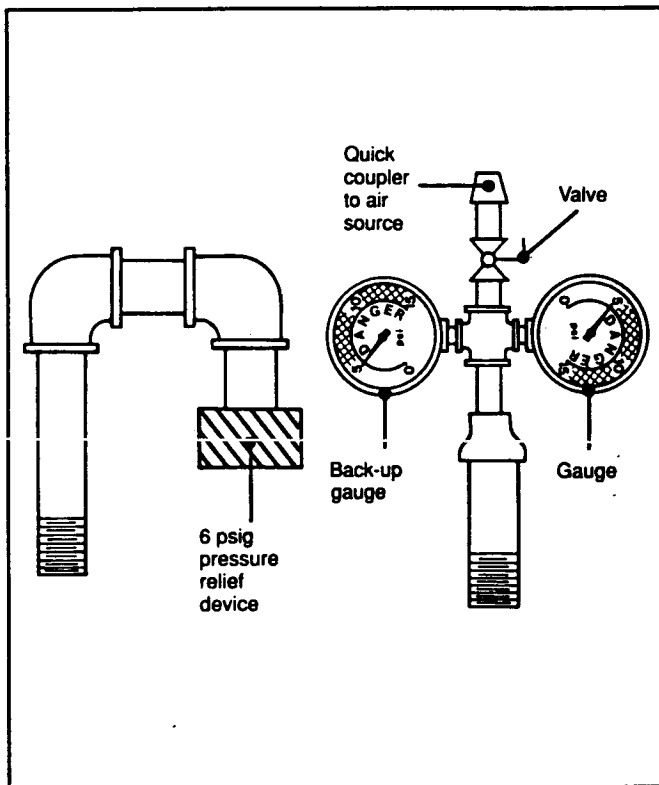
Gauge for air testing. Selection and care of gauges used for air testing tanks are essential; gauges should have maximum limit of 10-15 psig.
